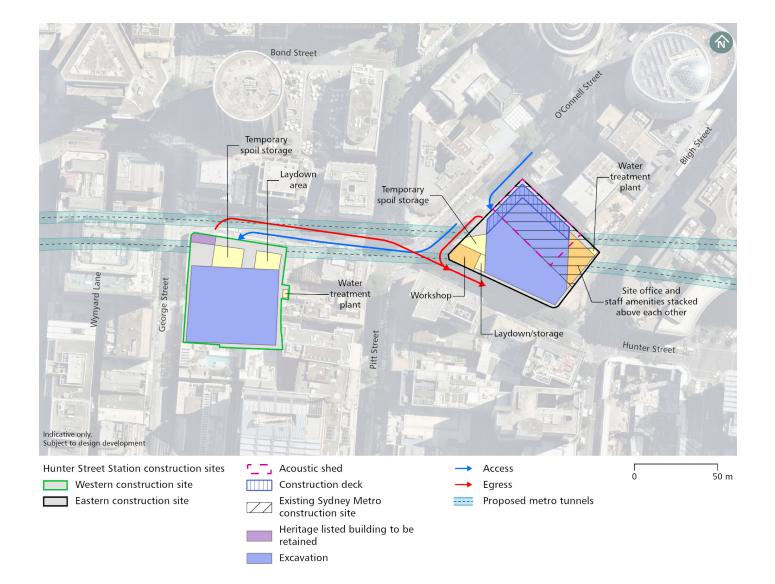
HUNTER STREET STATION CONSTRUCTION SITE LAYOUT
